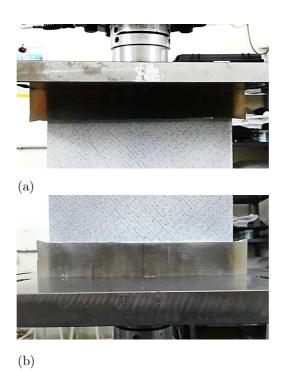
Specimen alignment: (a) top platen; (b) bottom platen
